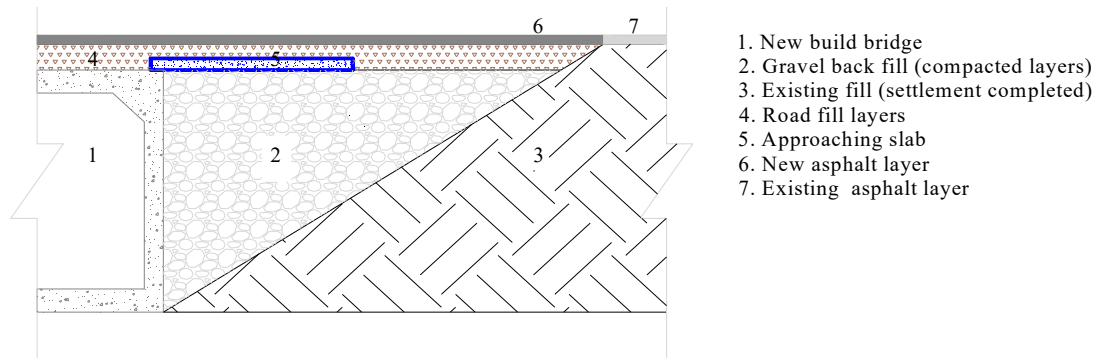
Cross section of the bridge, approaching slab, fill and asphalt layers
